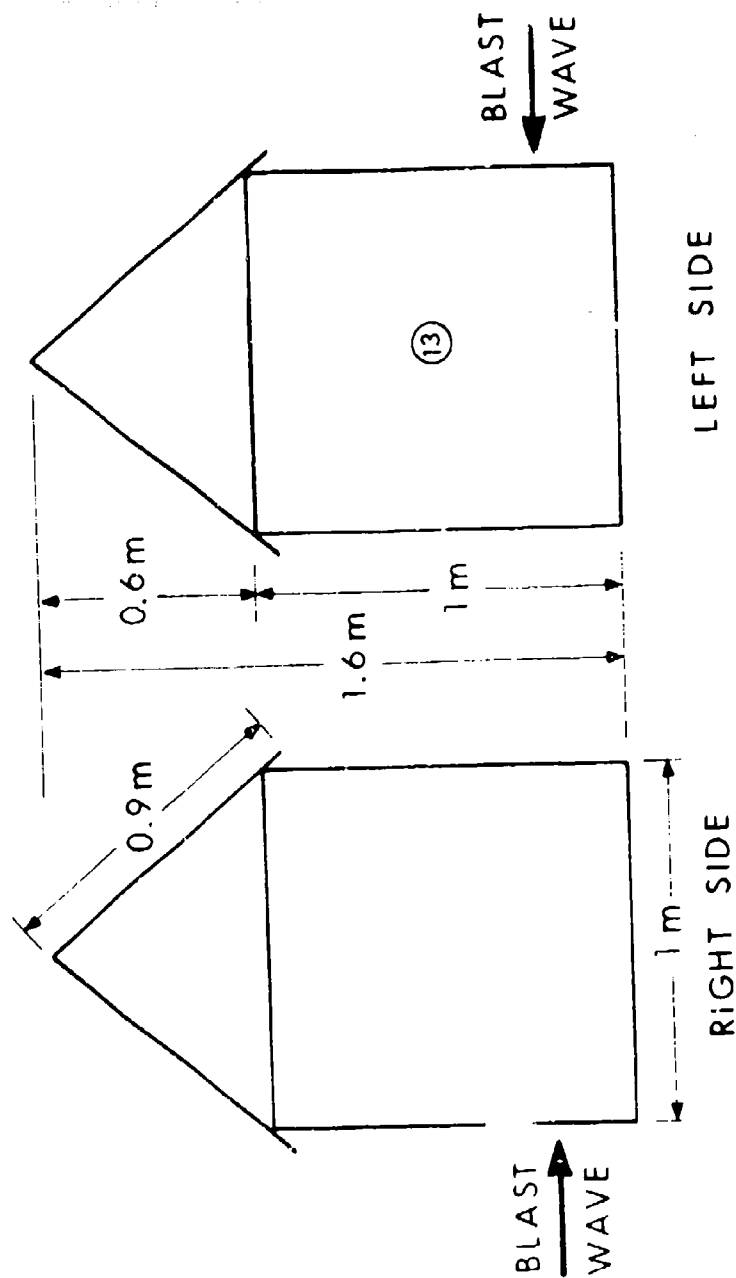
(Cont) Sketch of 1/8th scale model house - no openings.
